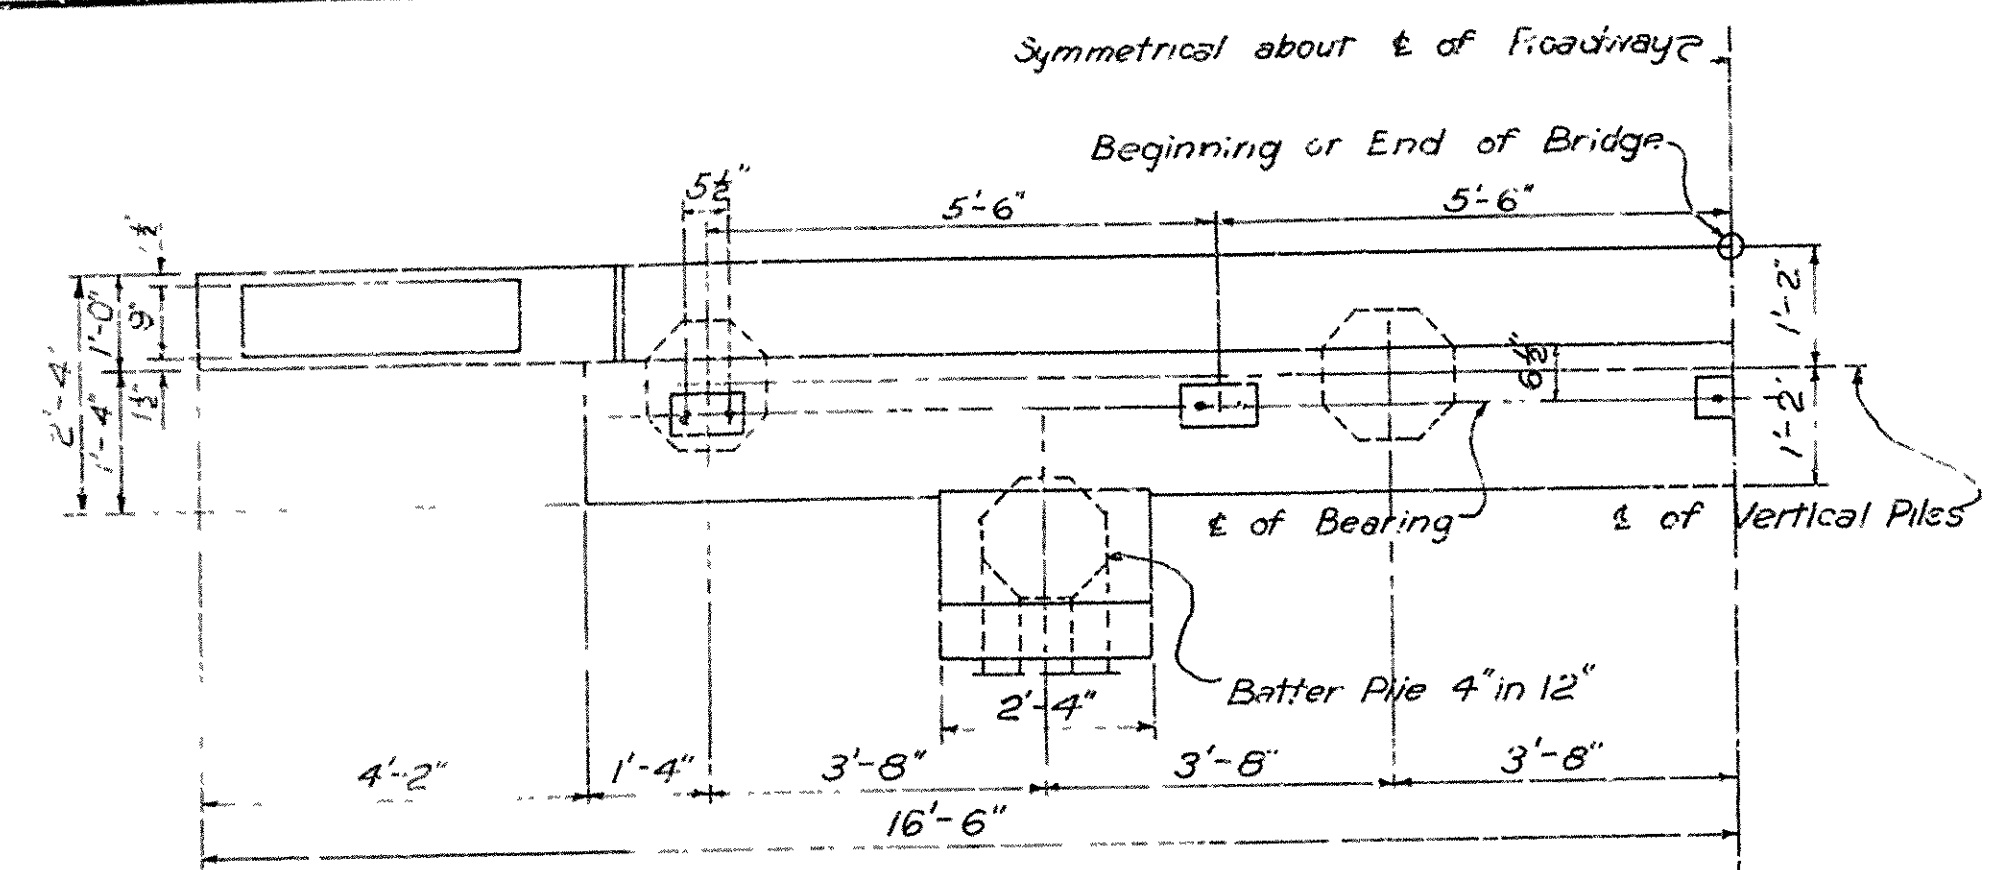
DETAILS OF STANDARD 30' TO 34' I-BEAM SPANS
